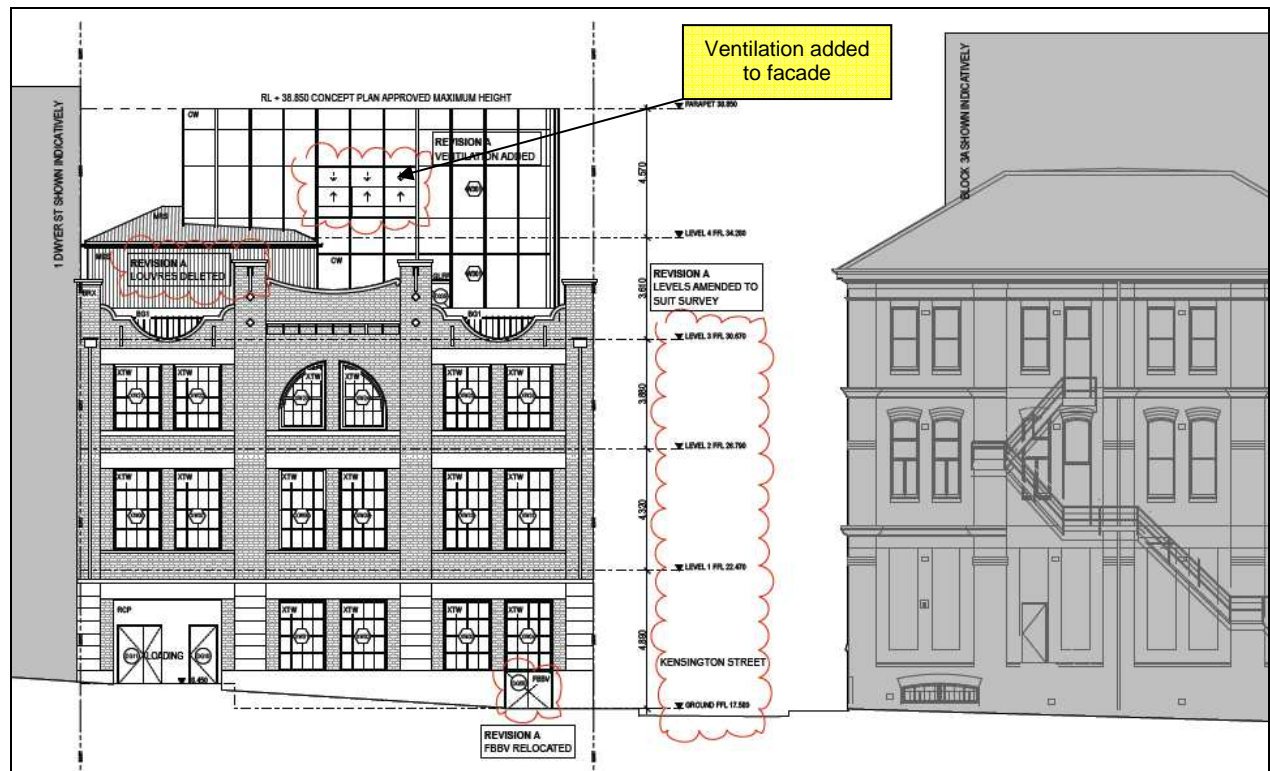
Proposed amendment to Level 5 of No. 2-10 Kensington Street illustrating location of ventilation added to northern facade (Source: Architectural plans from Proponent's Application)
